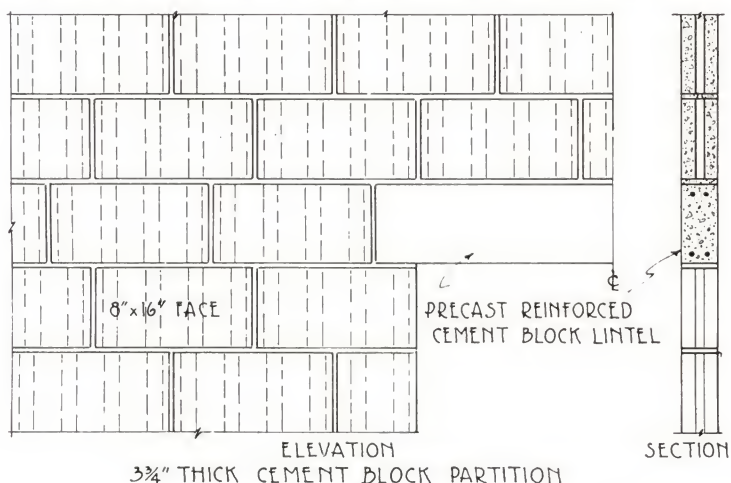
Elevation and section views of a cement block partition with a reinforced precast concrete lintel over the opening.
